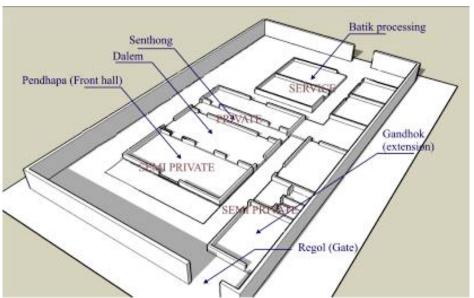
Sample [A] of the Javanese house: Original plan.
